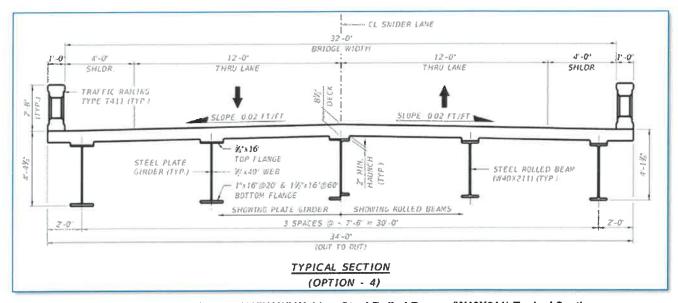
Steel Plate Girders (40"X1/2" Web) or Steel Rolled Beams (W40X211) Typical Section
